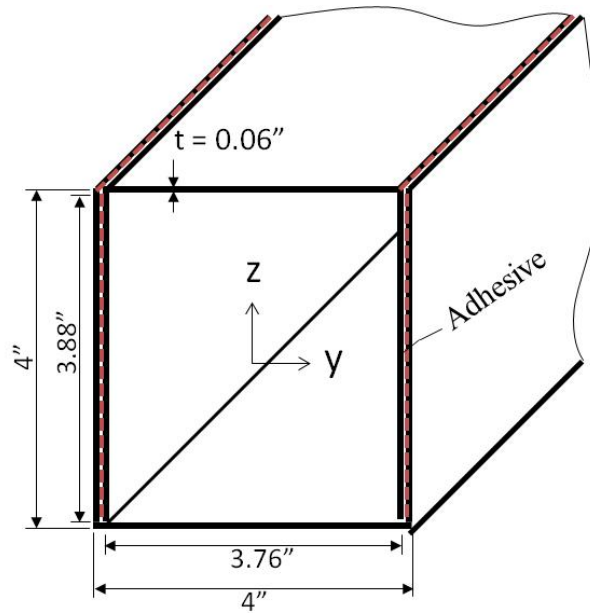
Illustration of “Adhesive-No-Foam” Column Cross-Section, as Oriented During Test to Failure
